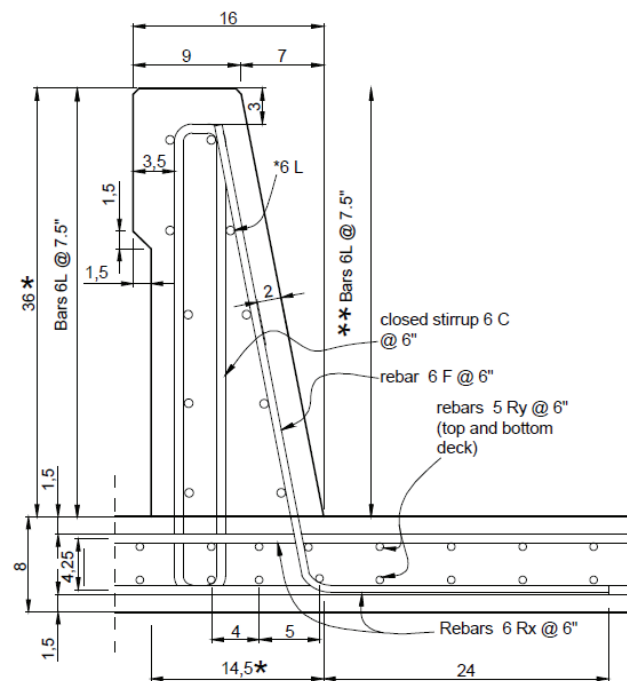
Traffic barrier 36" single slope with Closed Rectangular GFRP Stirrups, all measurements in inches (1in = 25.4 mm)
